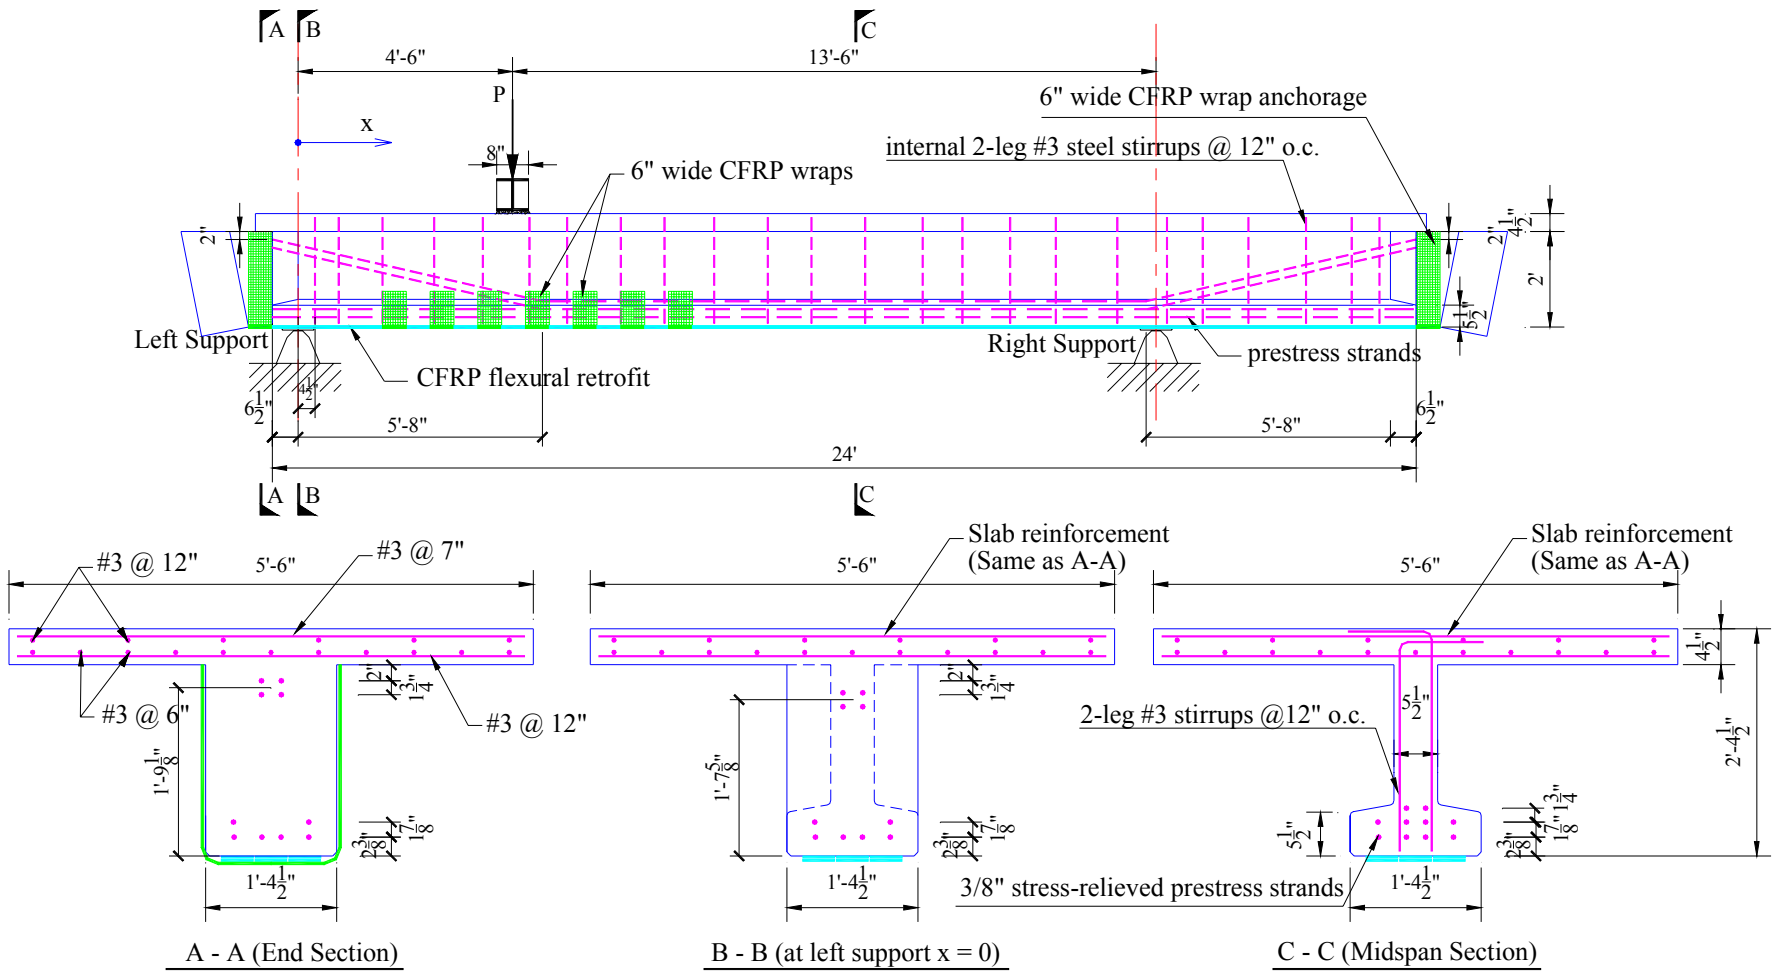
T-Beam 3 layout for the control shear strength calculation
